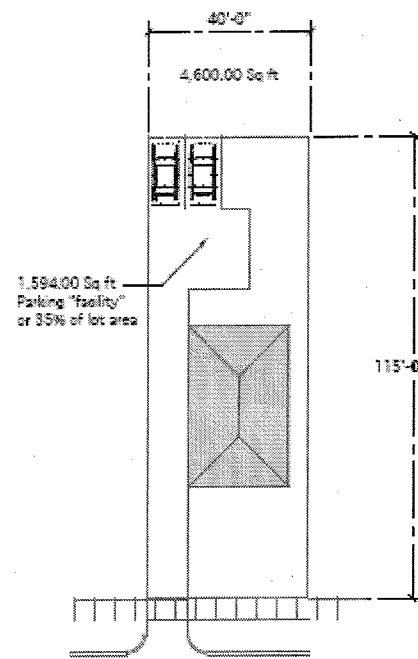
Demonstration site plan of lot with no alley (P. Carlsen)
